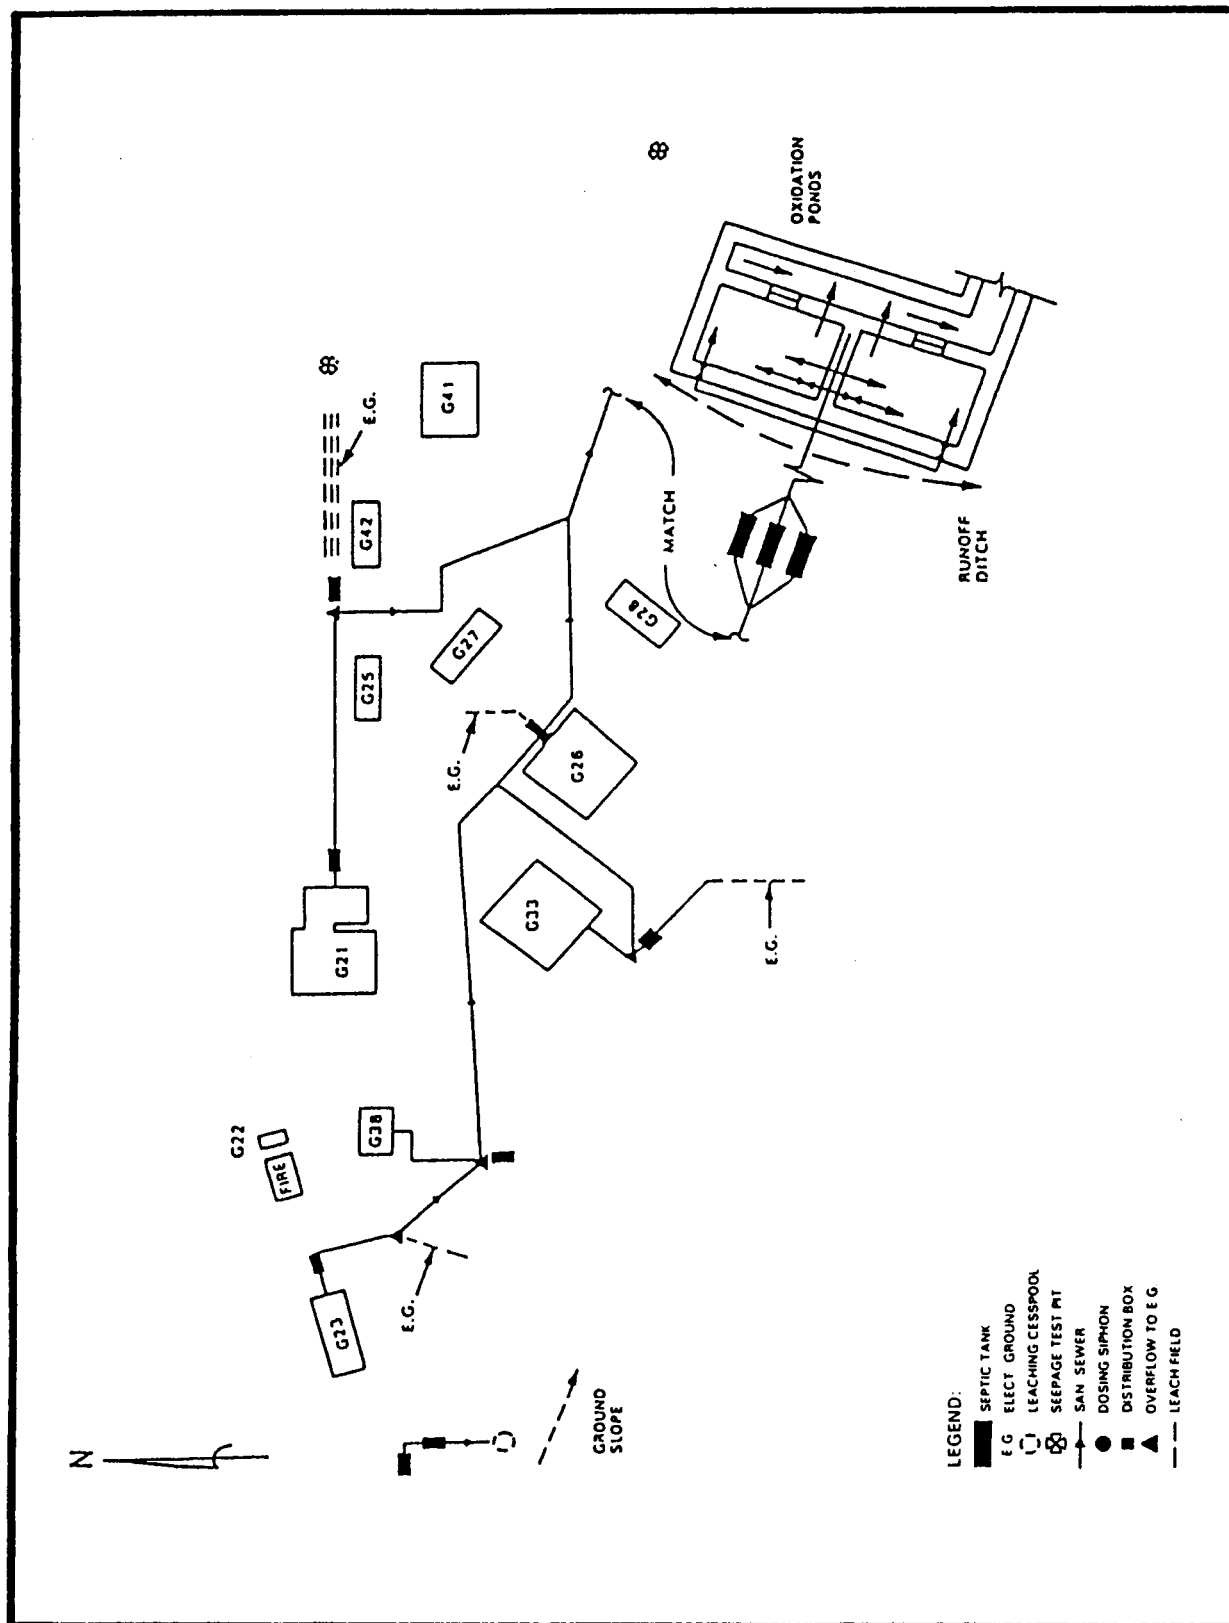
Location of Septic Tank System and Oxidation Ponds at Echo Site
